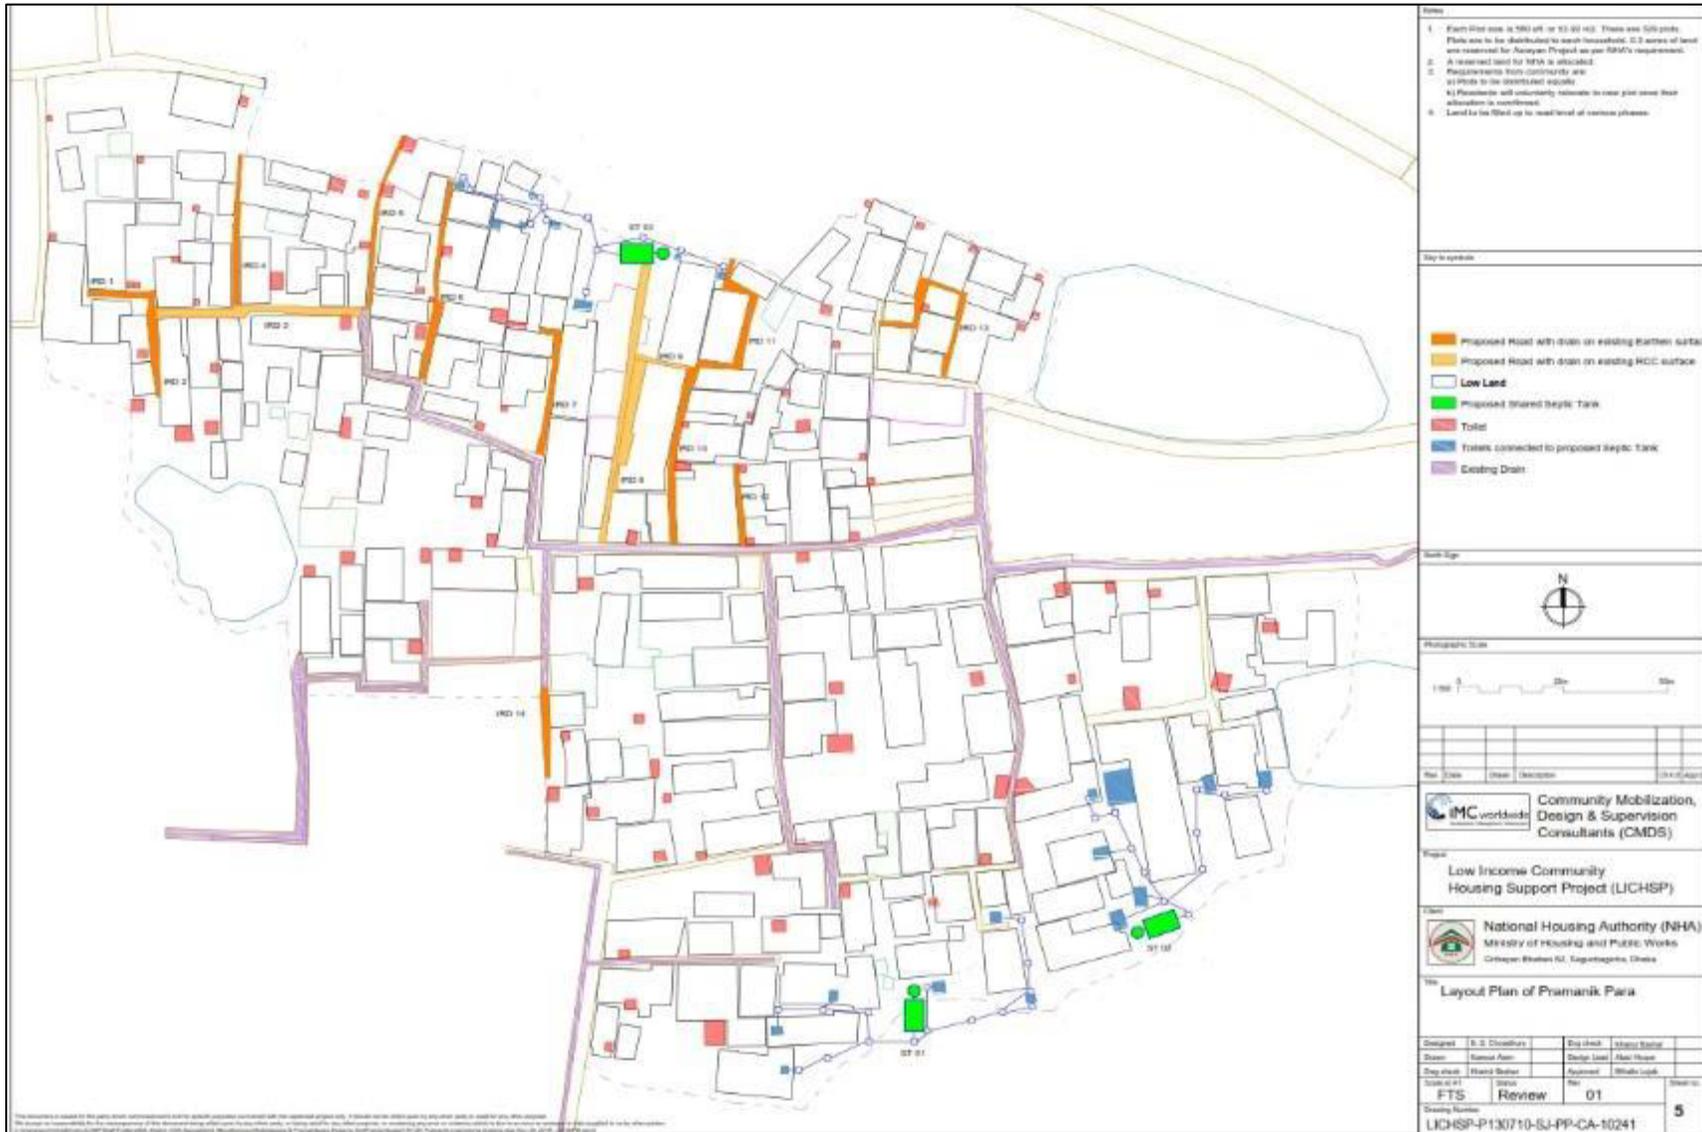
Lay out plan of proposed interventions at Pramanik Para settlement
